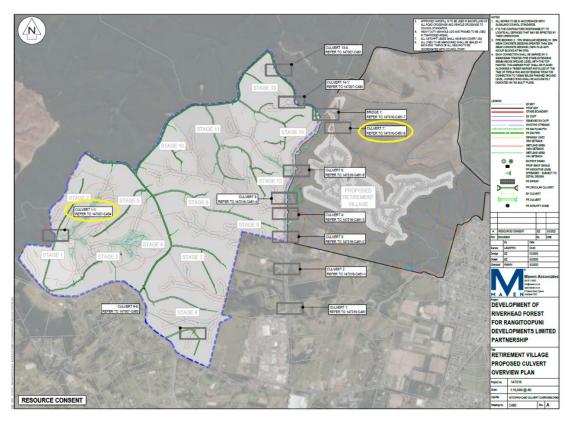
Attenuation Culvert Locations - Retirement Village Proposed Culvert Overview Plan DWG. C480, Rev A (Maven)
